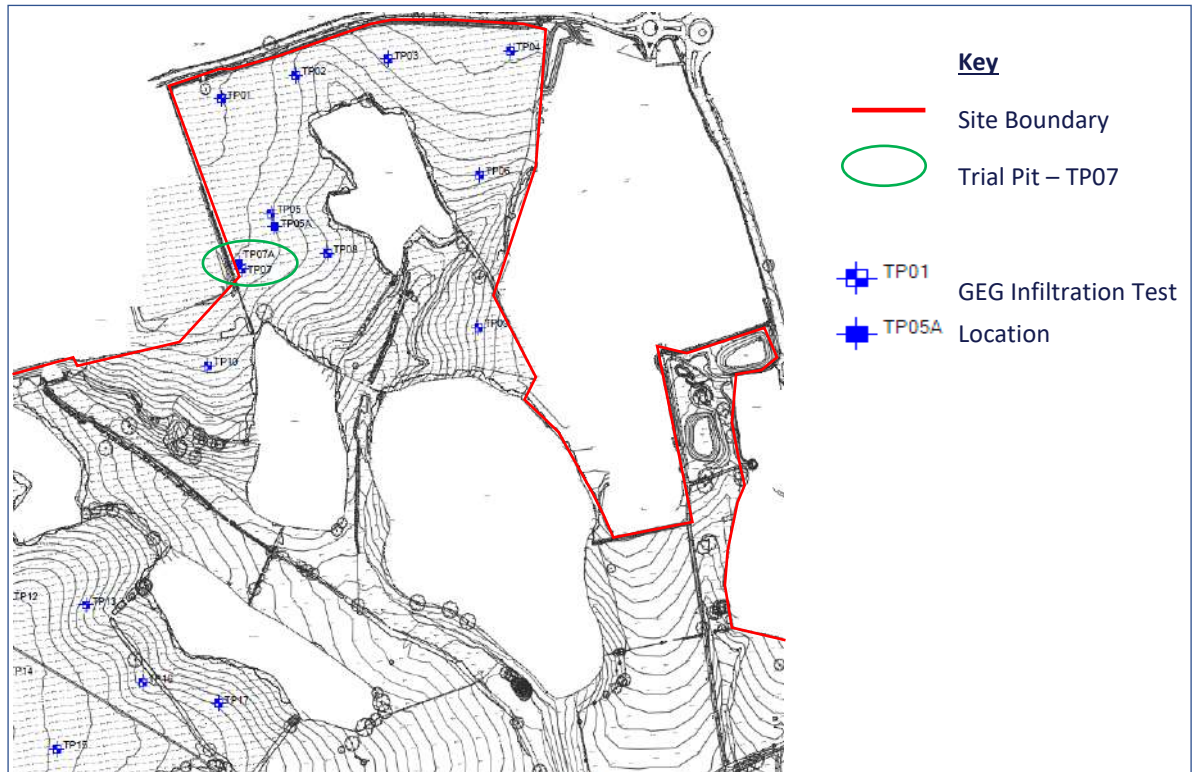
GEG Infiltration Trial Pit Location Plan extract (Report GEG-14-352)
